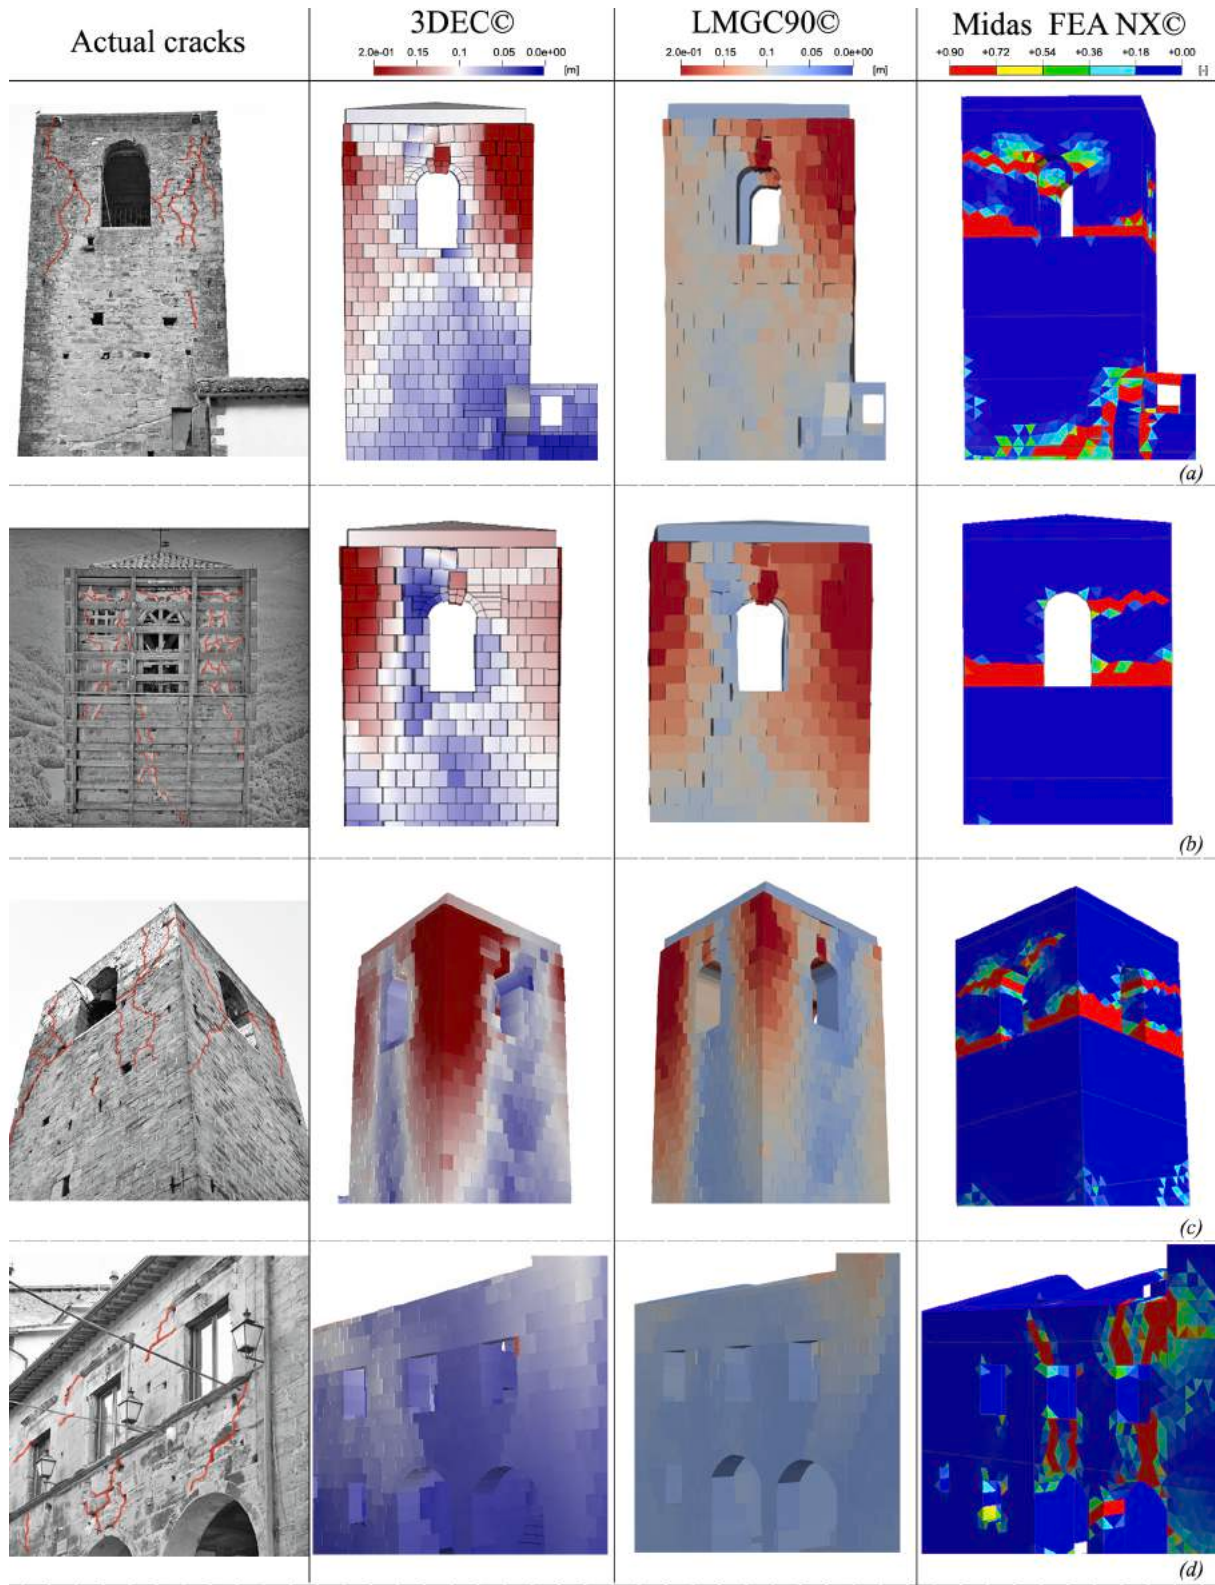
Comparison of the actual cracks and the numerical damage, obtained with each software, for the whole structure. (a) Bell-tower North façade; (b) Bell-tower West façade; (c) Bell-tower South-East corner; (d) Podestà Palace south façade.
